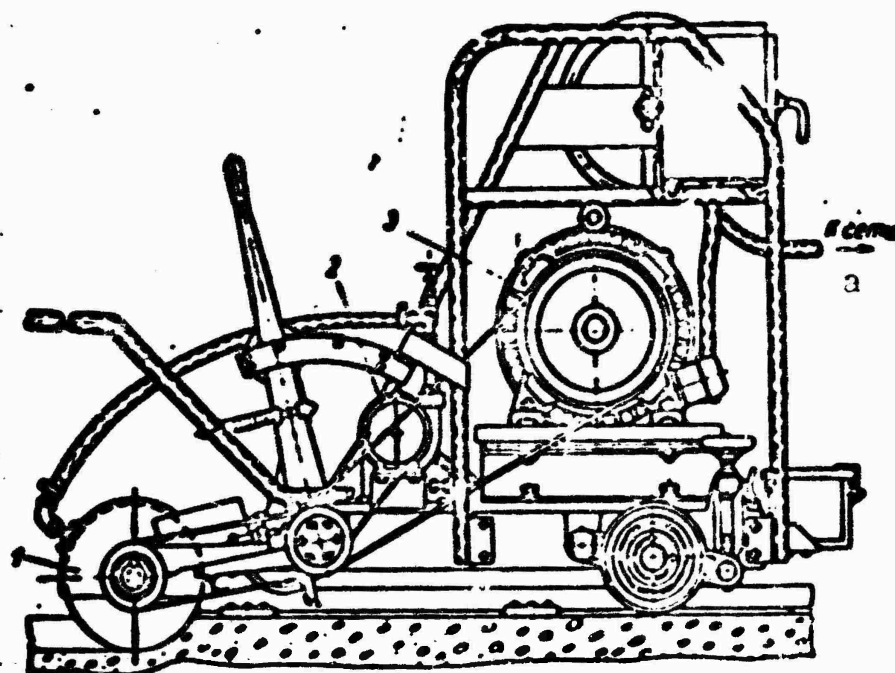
Diagram of a single disk temperature joint sawing machine. 1) Cutting disk; 2) water pump; 3) electric motor; a) to the line.
